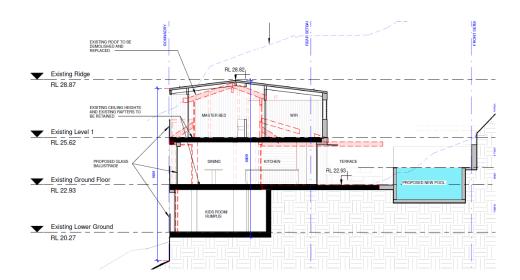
Section indicating proposed roof exceeding Council's height of buildings control (Source: C+M Studio)
